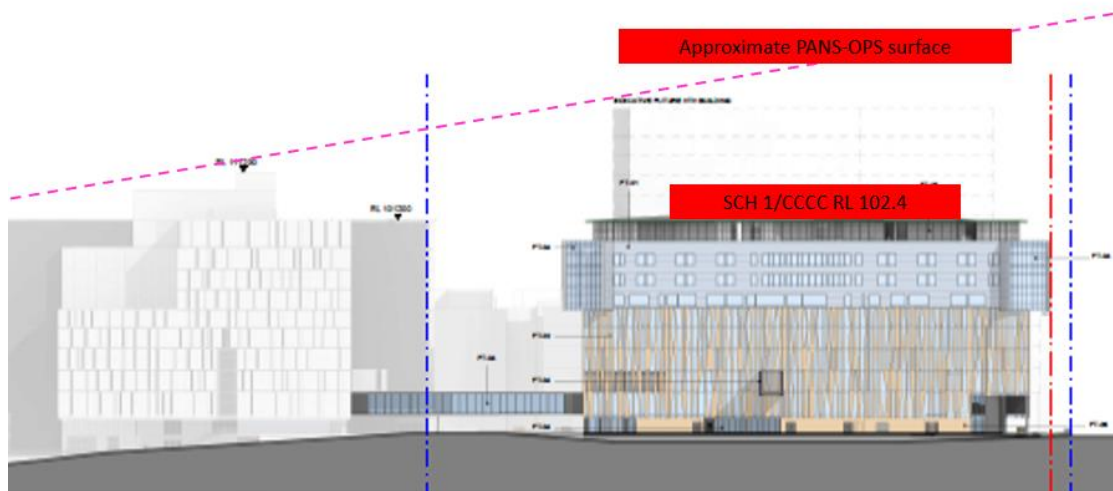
The SCH Stage 1/CCCC East Elevation showing Sydney PANS-OPS Surface
